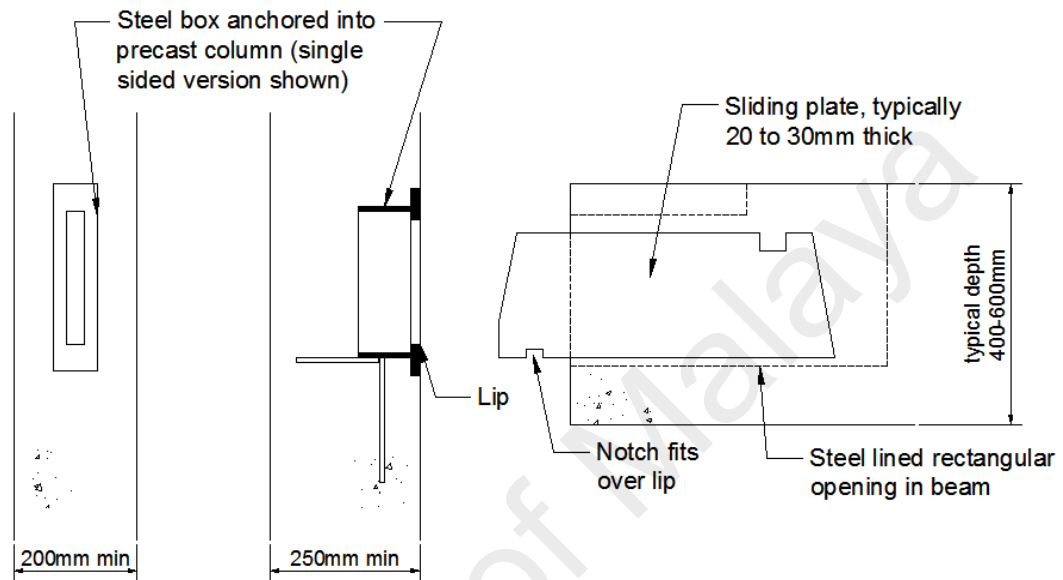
Precast beam to column connection using open box and notched plate in beam (Elliott, 1996)
